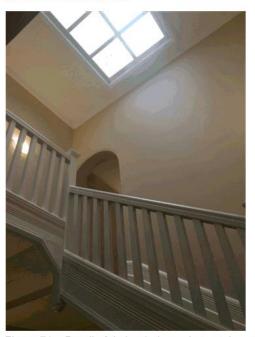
Detail of timber balustrade to stair and timber framed skylight in ceiling.
